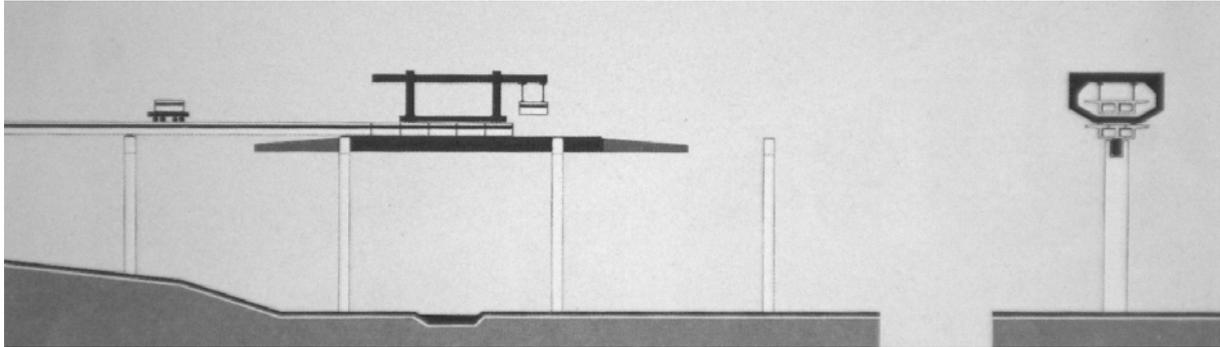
Illustration of span-by-span construction of precast segments. (Wittfoht)
